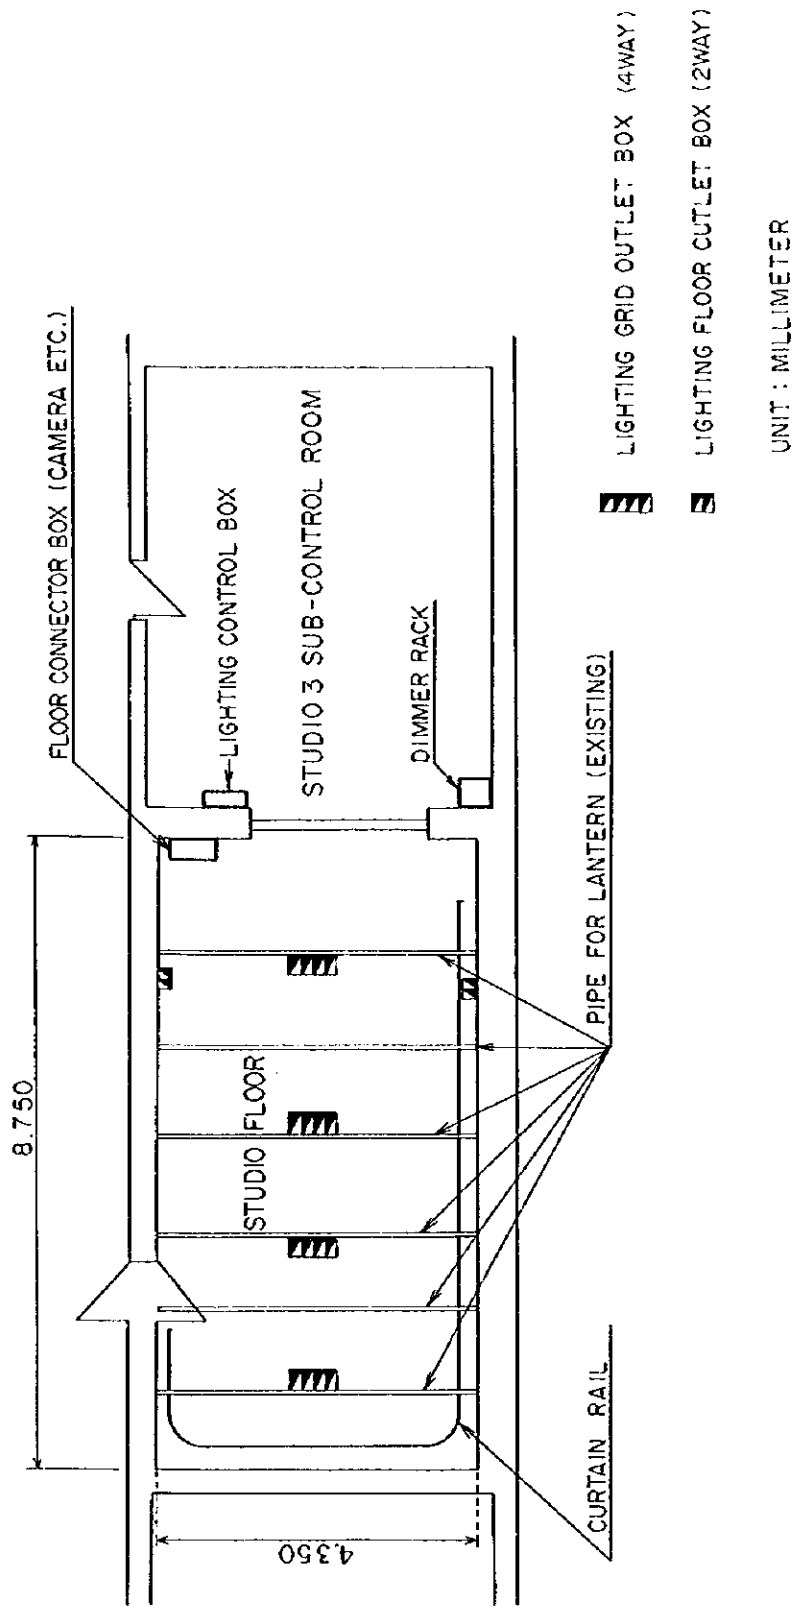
Equipment Layout of Studio 3 Studio Lighting
